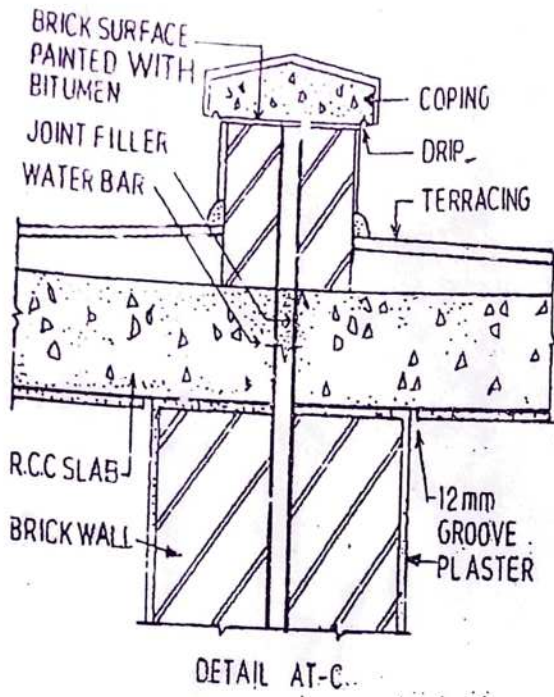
Details of expansion joint at roof level (For section refer Fig. 245
